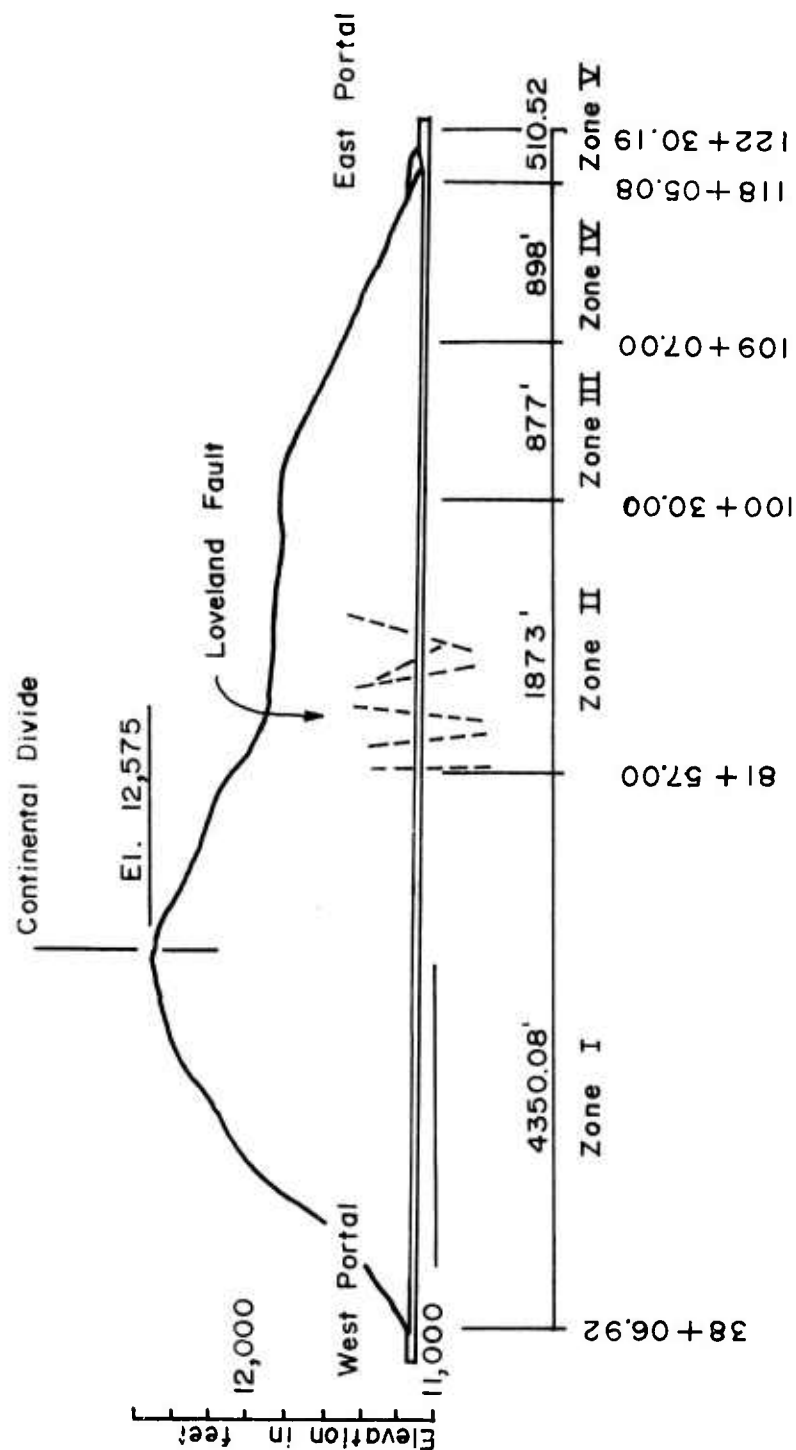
SECTION OF THE STRAIGHT CREEK TUNNEL
